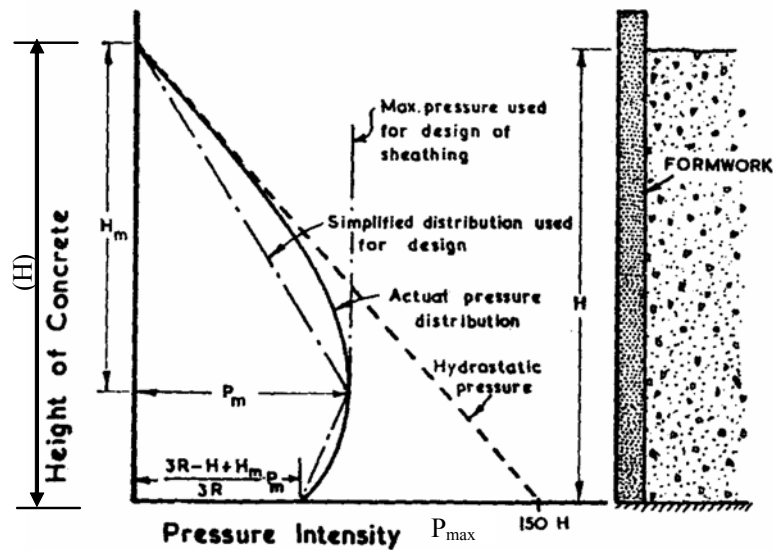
Concrete pressure distribution on formwork [Rodin, 1952]
